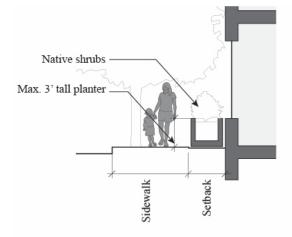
Raised planters in setbacks shall not be taller than 3'.
